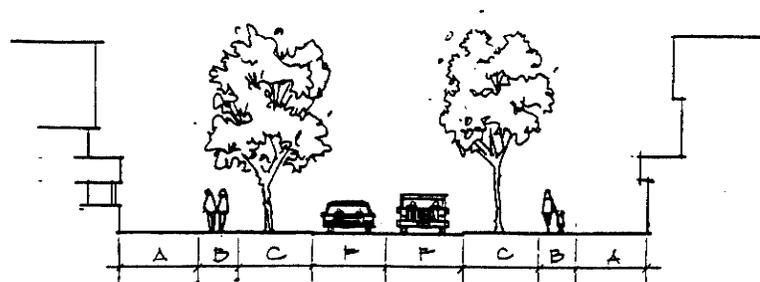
Schematic sketch of a typical sub-collector street cross-section. Table 1 lists the recommended dimensions of each component: A) building setback from street right-of-way; B) walkway; C) planting area; E) bicycle lane; F) travel lane.
